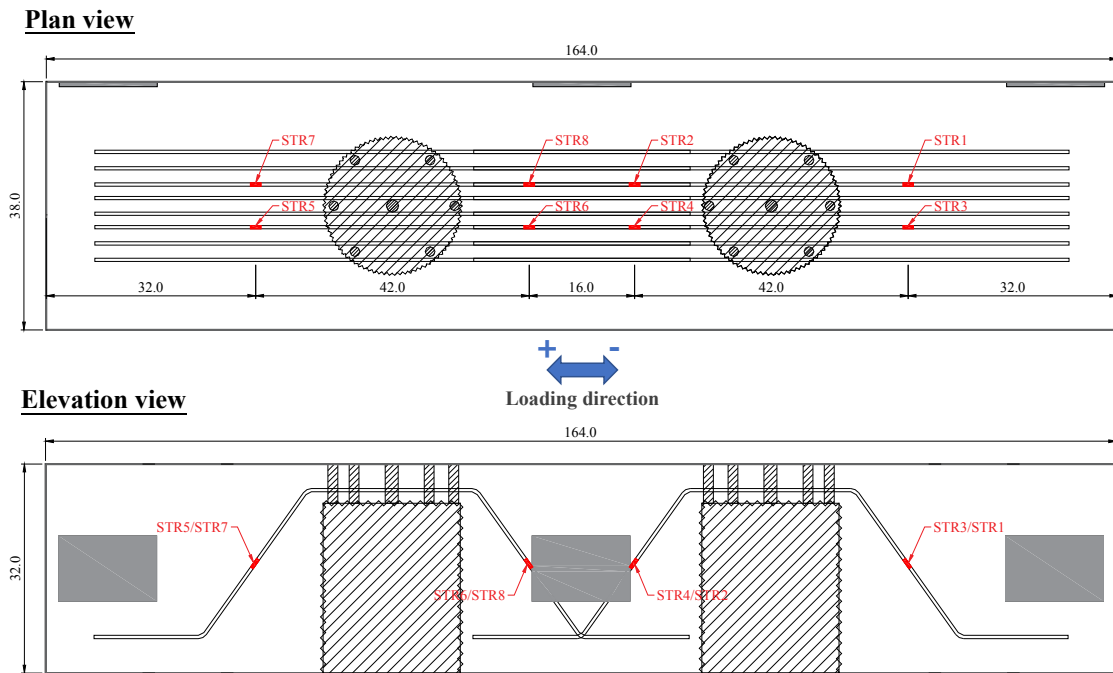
Strain gauges layout on the stirrups of the cap beam.
